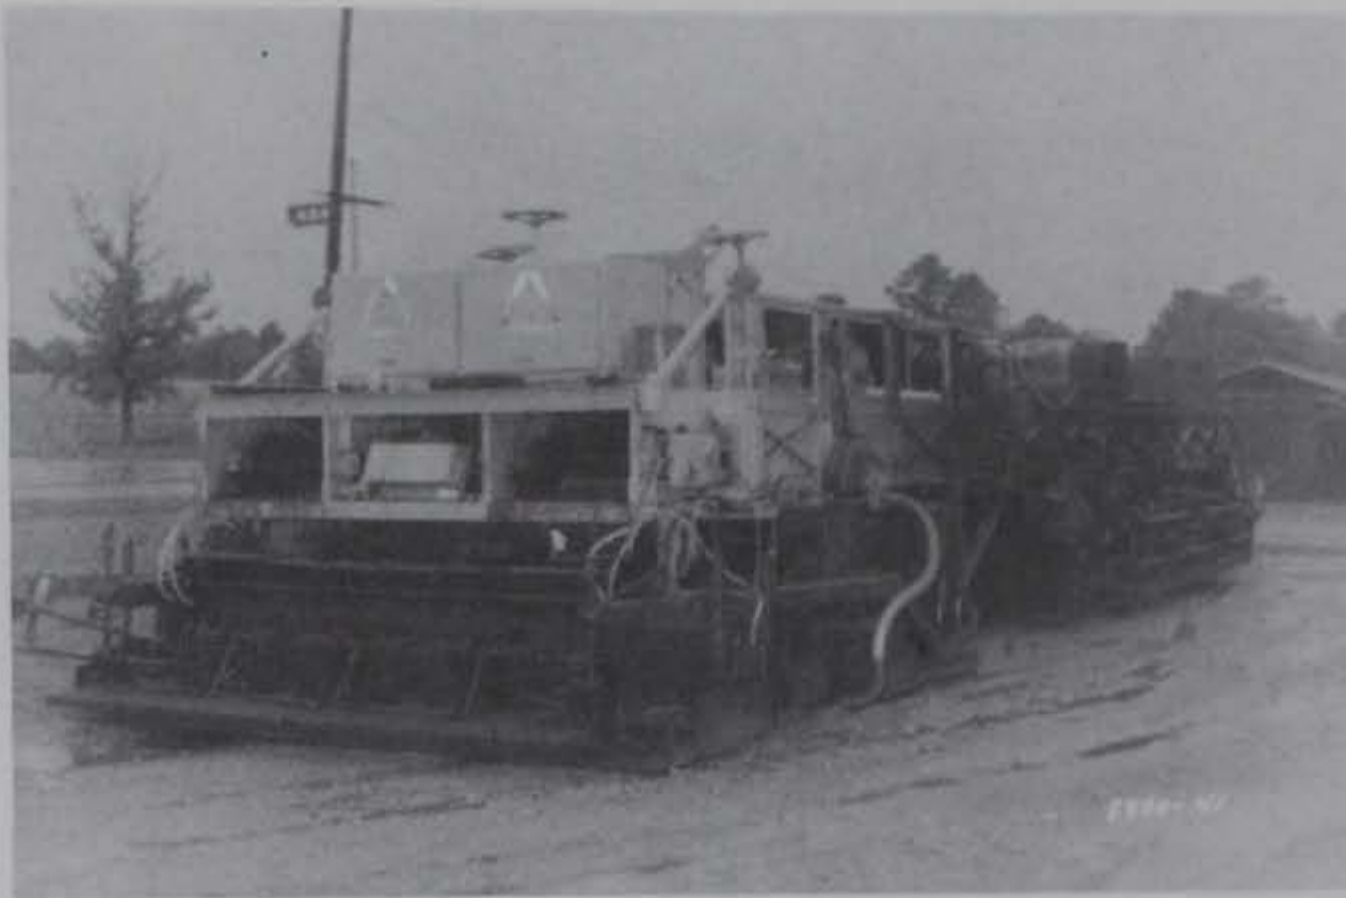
Last machine in recycling train with conveyor system through the machine to carry asphalt mixture to paving screen
